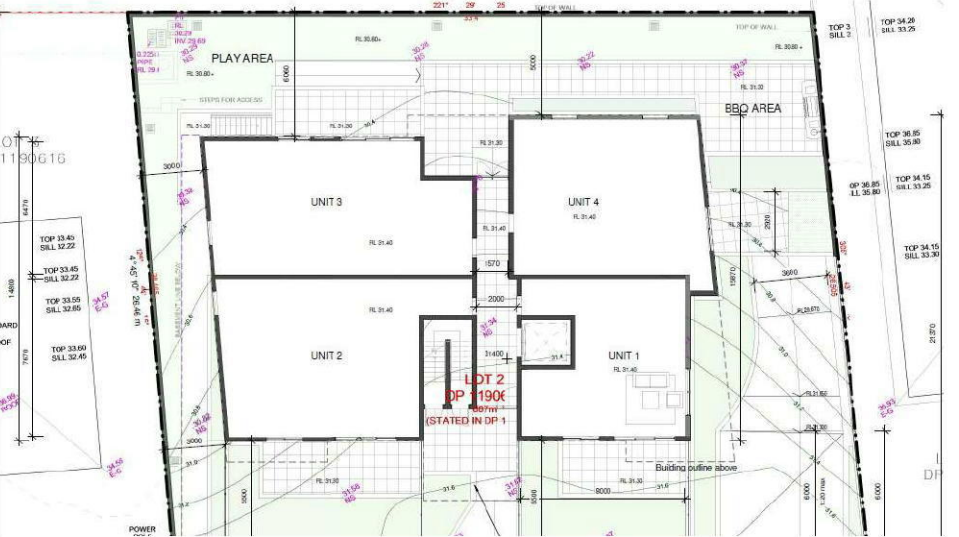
Site Plan (Source: CAD Design Solutions, DA02, Issue A, June 2016).
